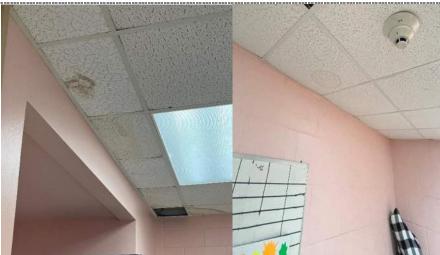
Water stained ceilig tiles in room to the Southwest corner of Cafeteria-building
